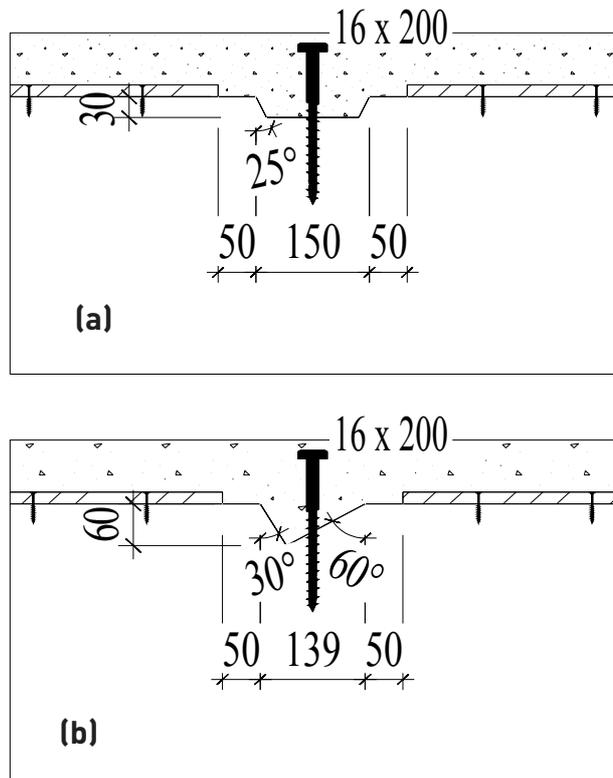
Notched connections – trapezoidal (a) and triangular (b) shapes (12 and 16 mm coach screw are used for 45 and 63 mm thick LVL beams respectively).
